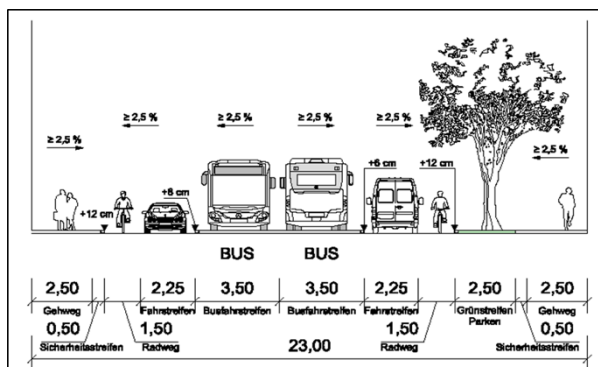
BRT road cross-section (Source: Möhring, 2014)
